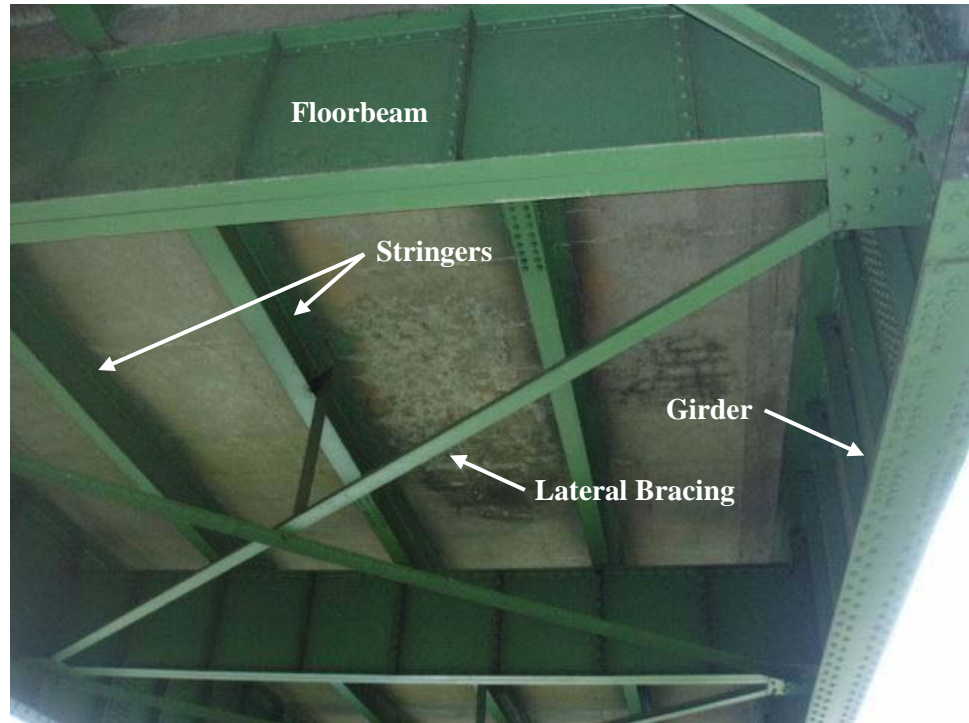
Underside View of Deck Girder Bridge with Lateral Bracing System
